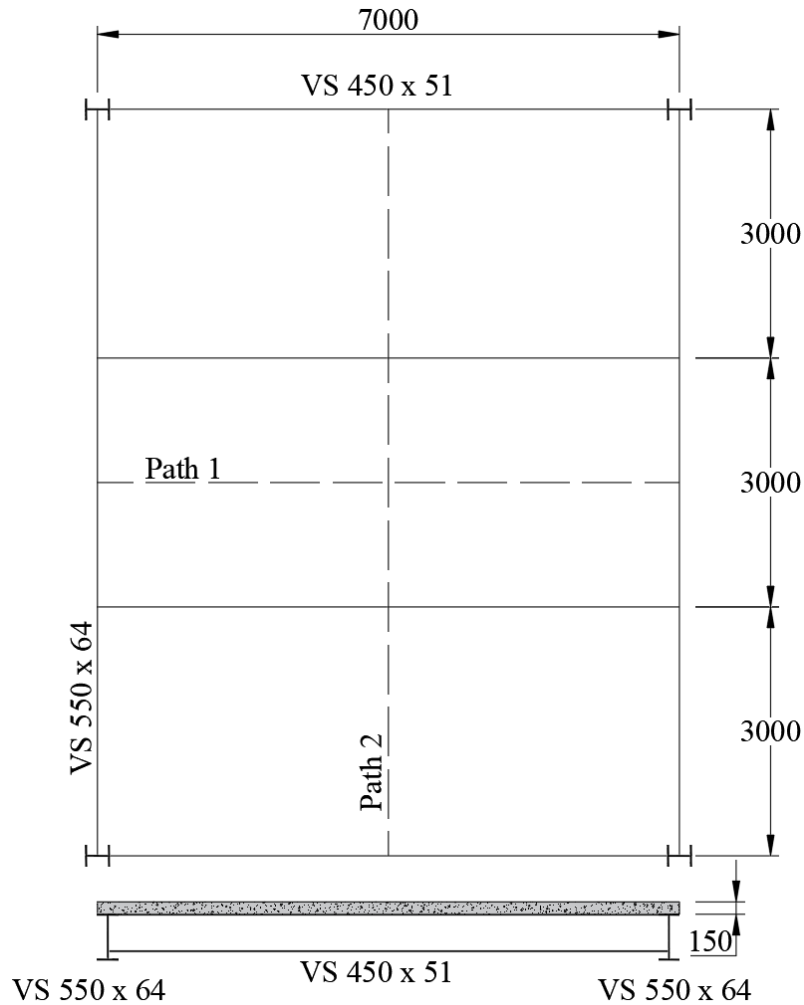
Structural plan of a composite slab, adapted from [36] (in mm)
